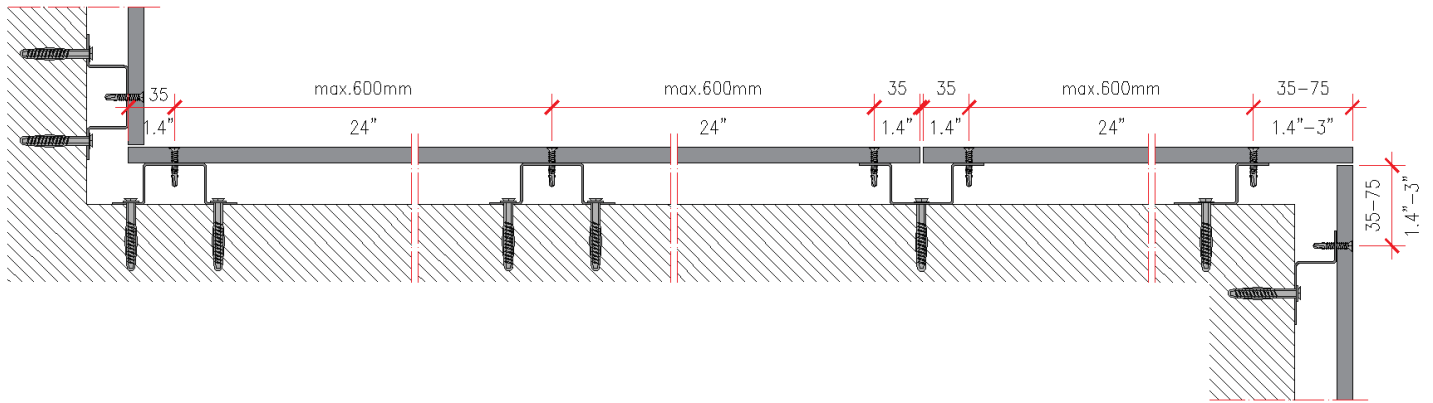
Horizontal section of wall cladding, galvanised steel structure
